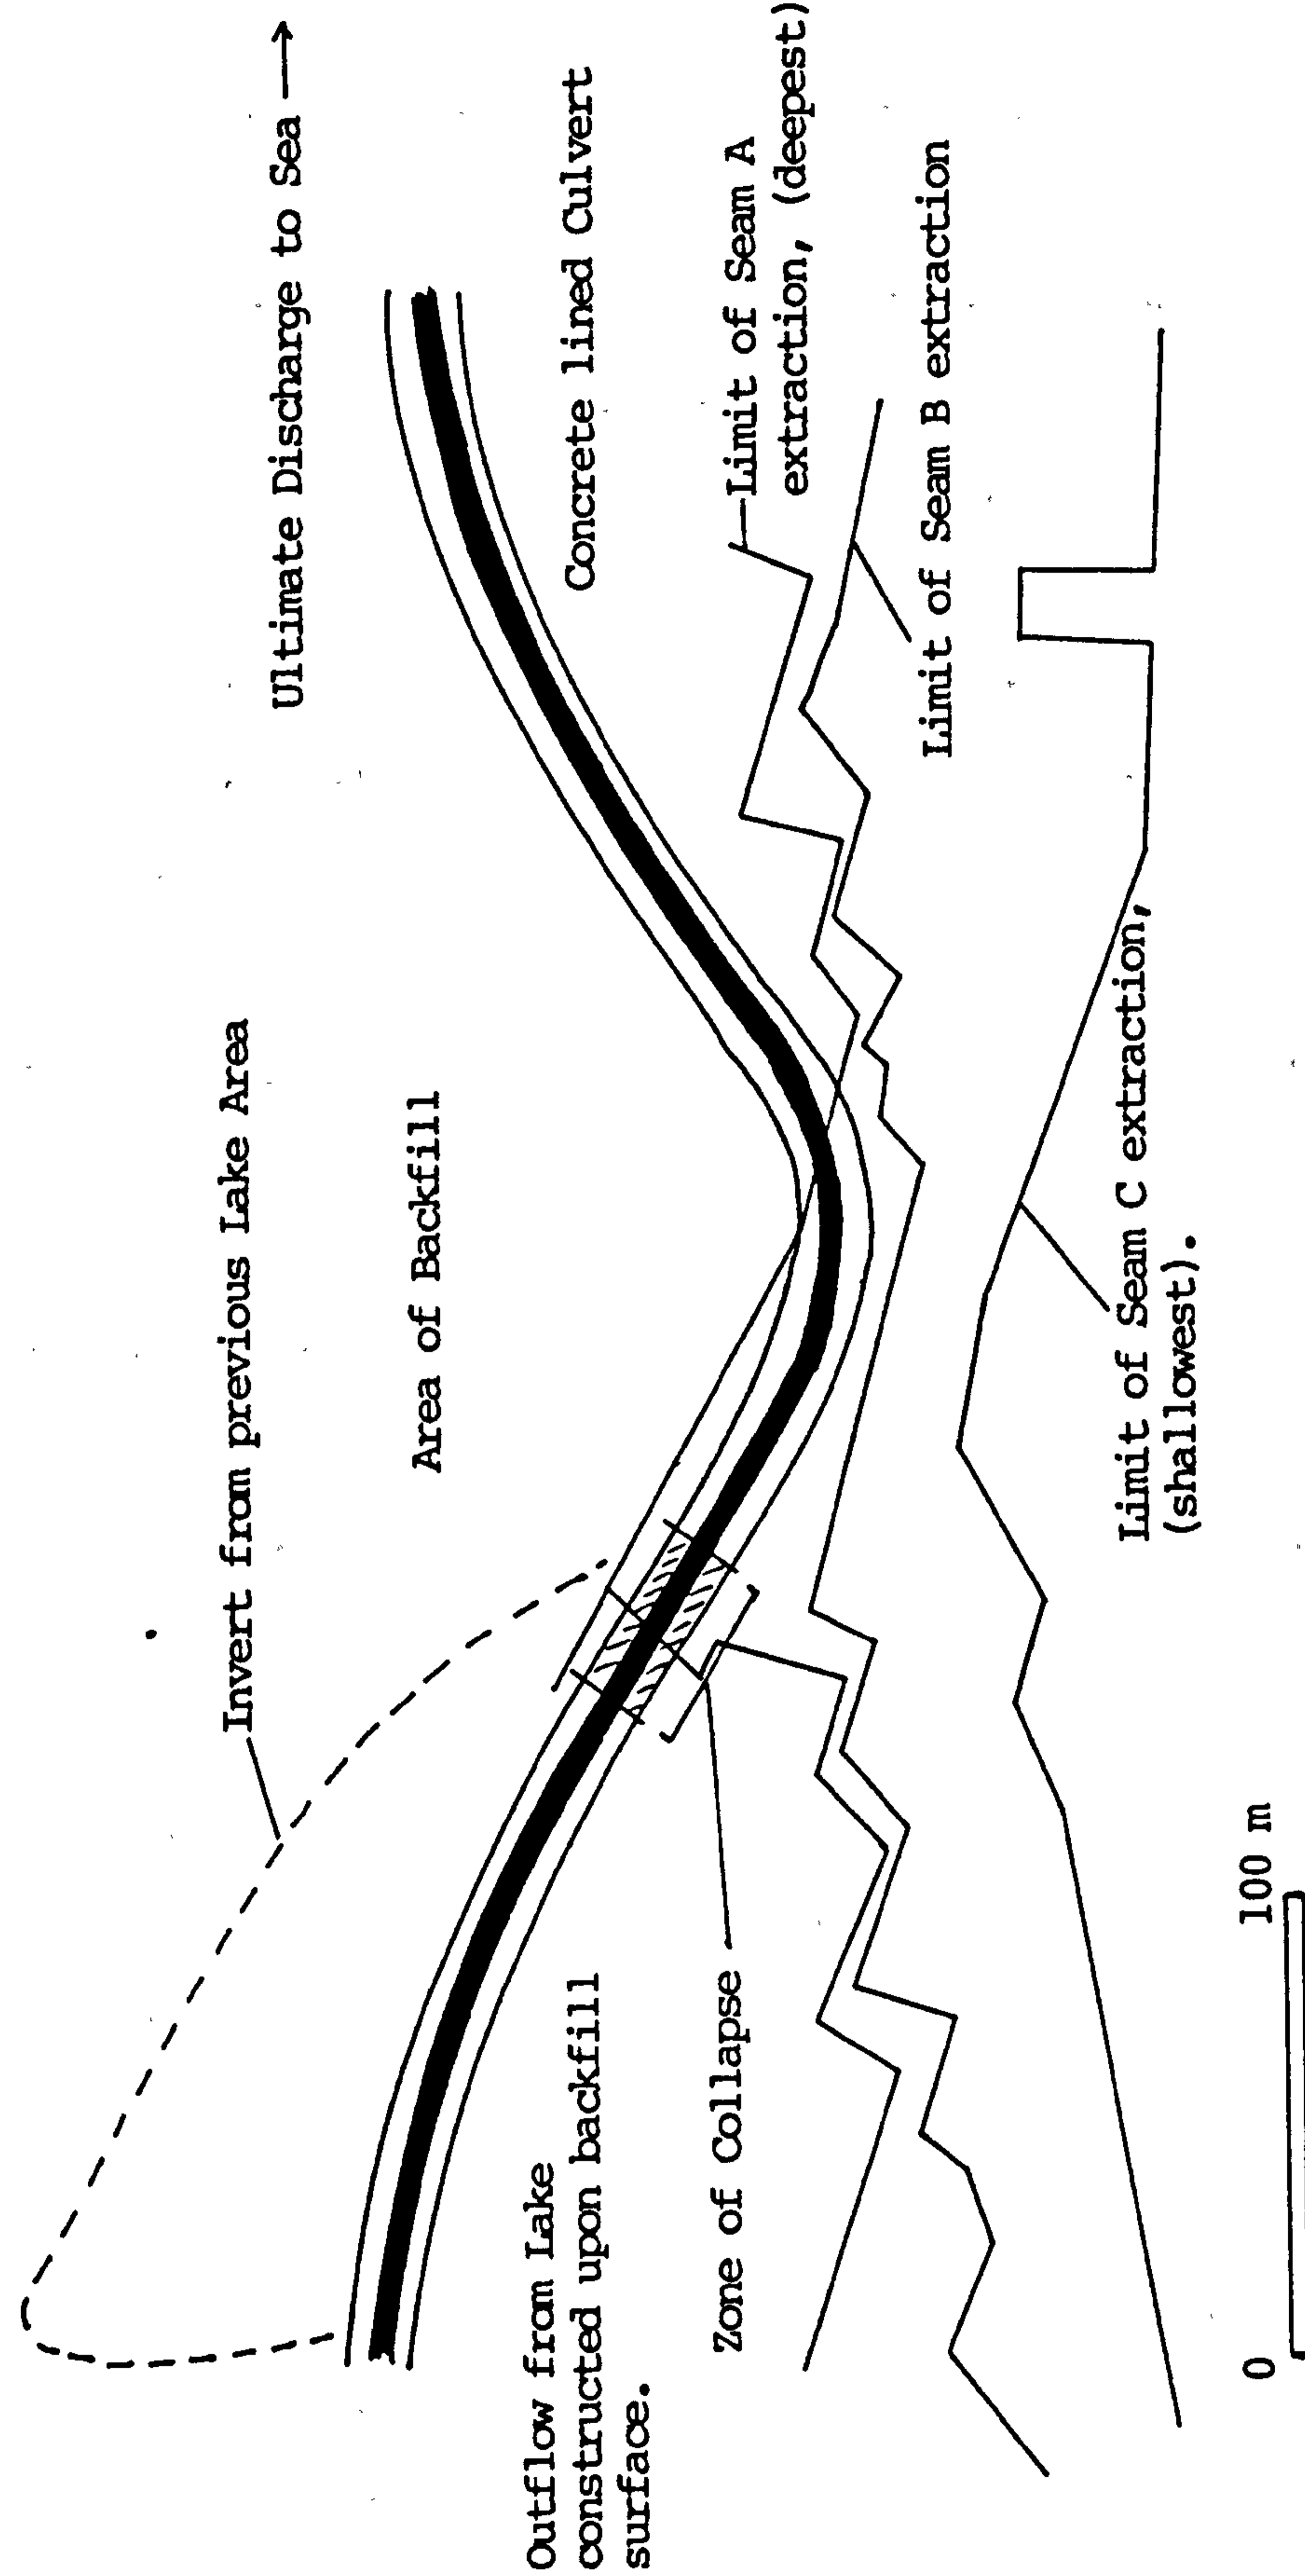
Damage to Concrete Lined Culvert constructed on Backfill, Site I.
